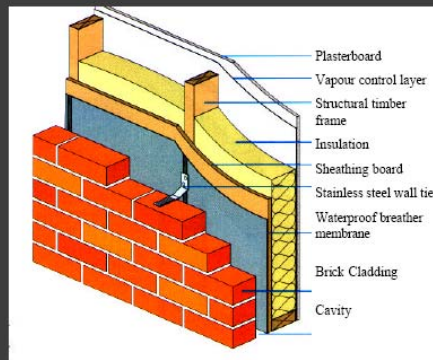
Typical timber frame wall (Source: Timber frame fact sheet, wood for good)
